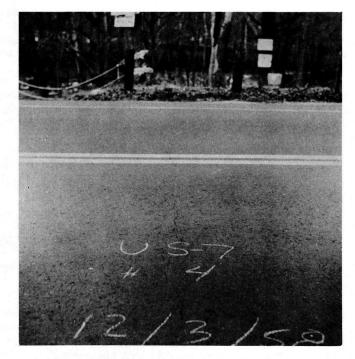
Uncontrolled Joint Crack Project No. 1-Route US 7, Norwalk, December 3, 1958.
